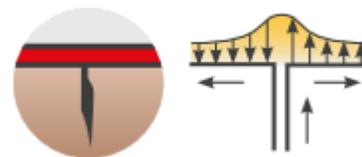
Crack propagation in an unreinforced pavement structure
